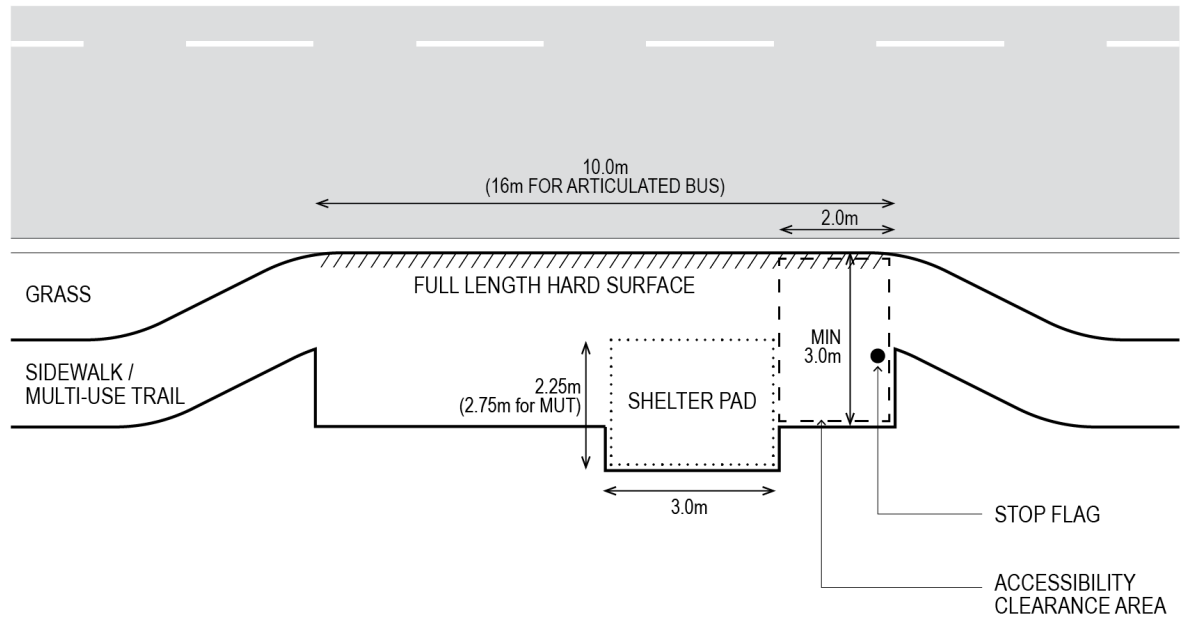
Typical Concept of Bus Stop with Additional Infrastructure – Boulevard
